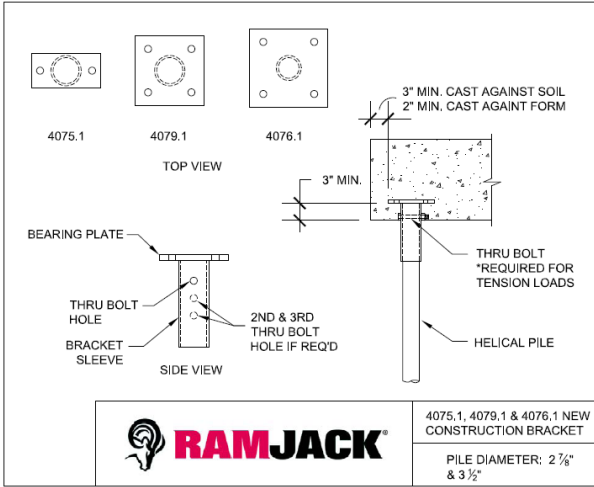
4075.1 AND 4079.1 NEW CONSTRUCTION BRACKETS
